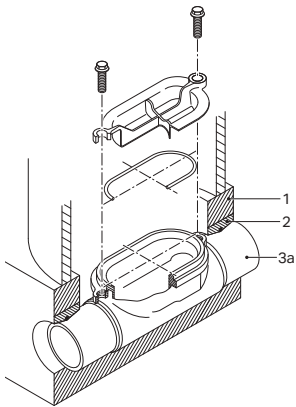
Geberit HDPE access pipe 90° with oval access cover
